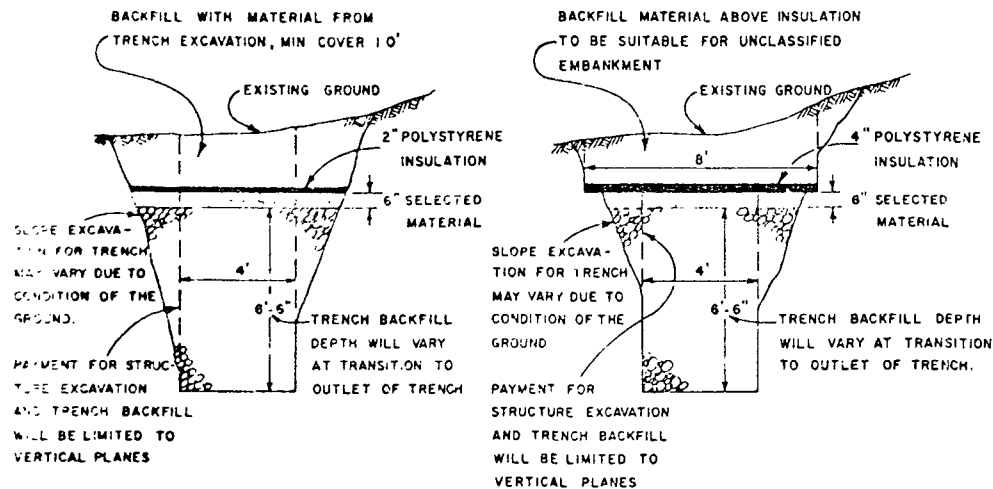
STEP CULVERT INSTALLATION WITH FRENCH DRAIN UNDERLAY
